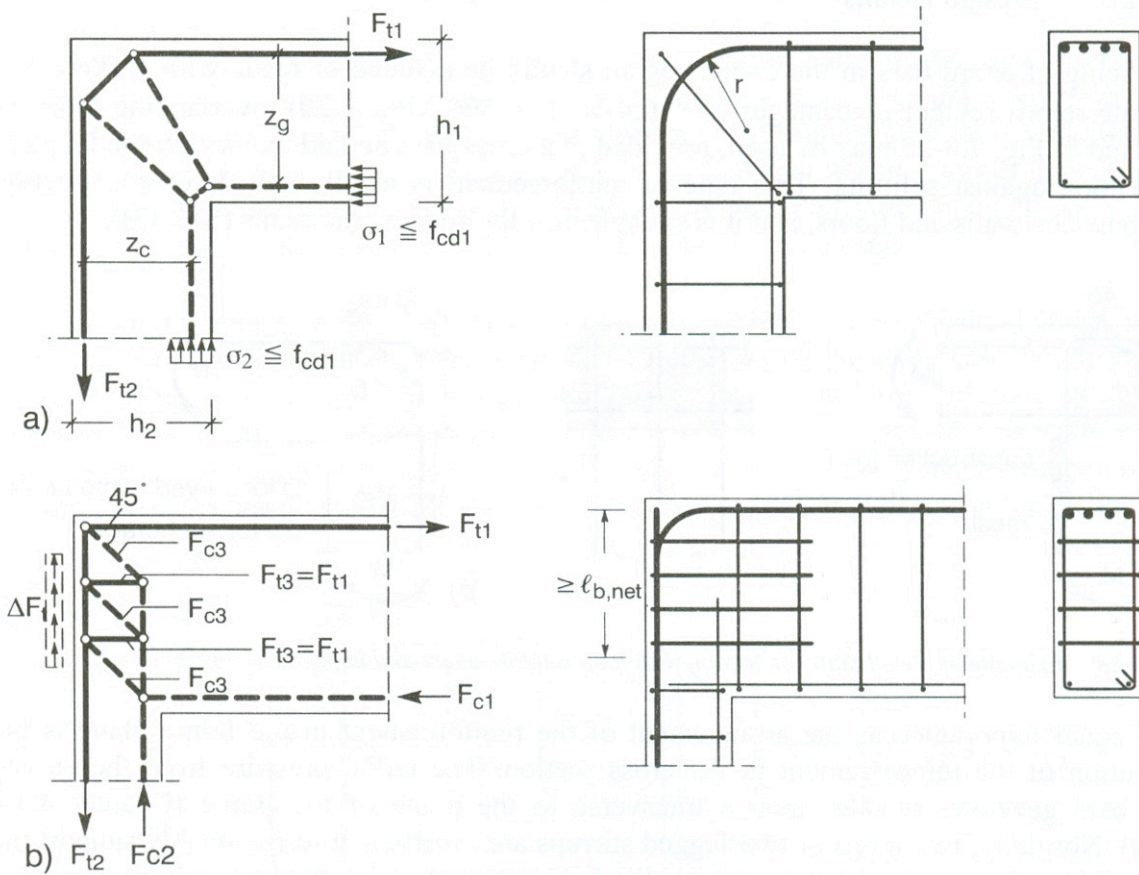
Beam-column-connection with closing moment. Model and reinforcement.
